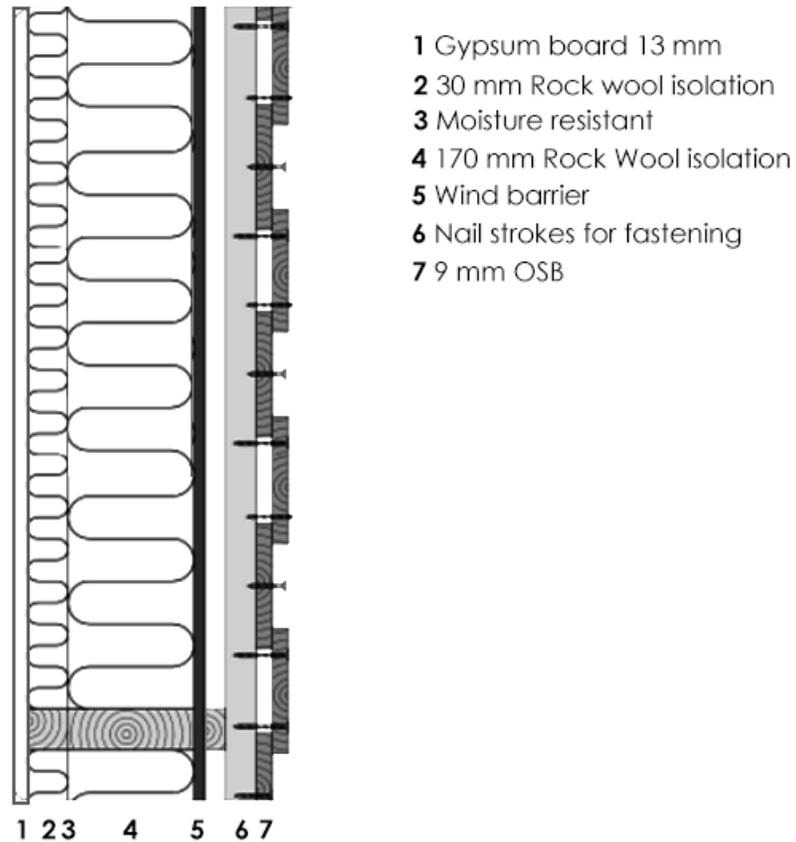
Example of a detail section of a Prefabricated sandwich timber panel.
